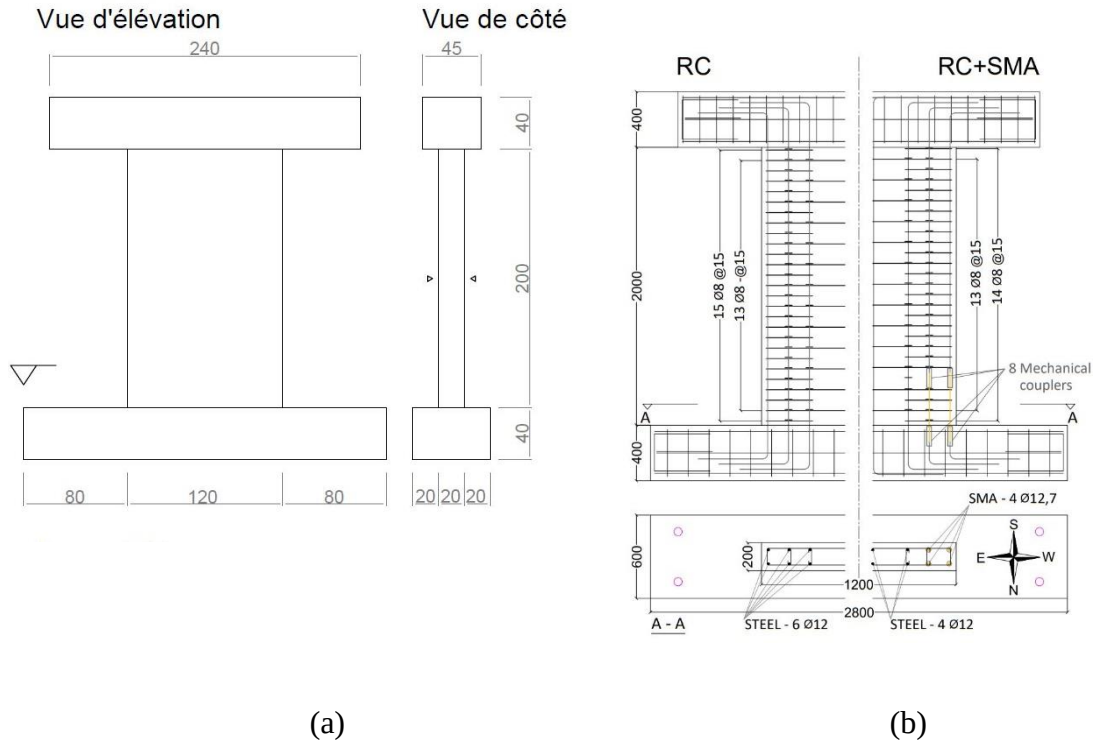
reinforcement layout of the two test units RC and RC+SMA wall. Units: (a) cm, (b) mm.
